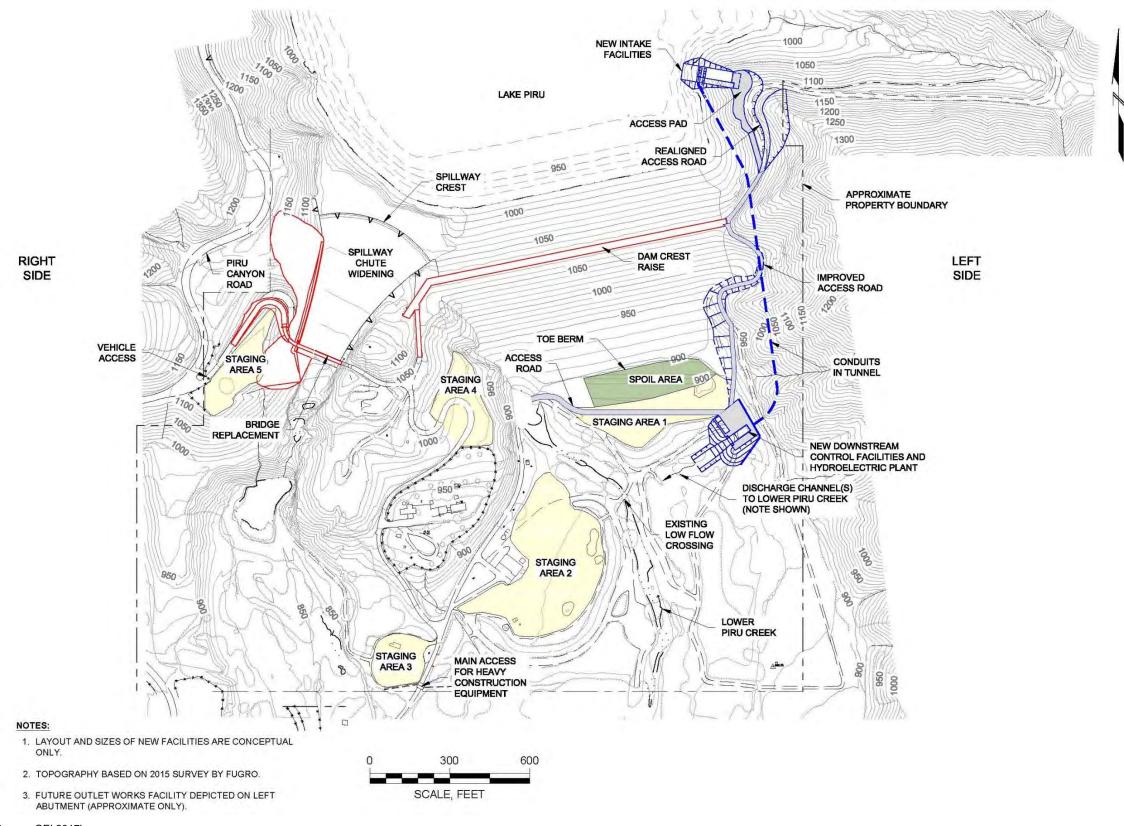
Spillway Widening Option Layout and Construction Footprint
